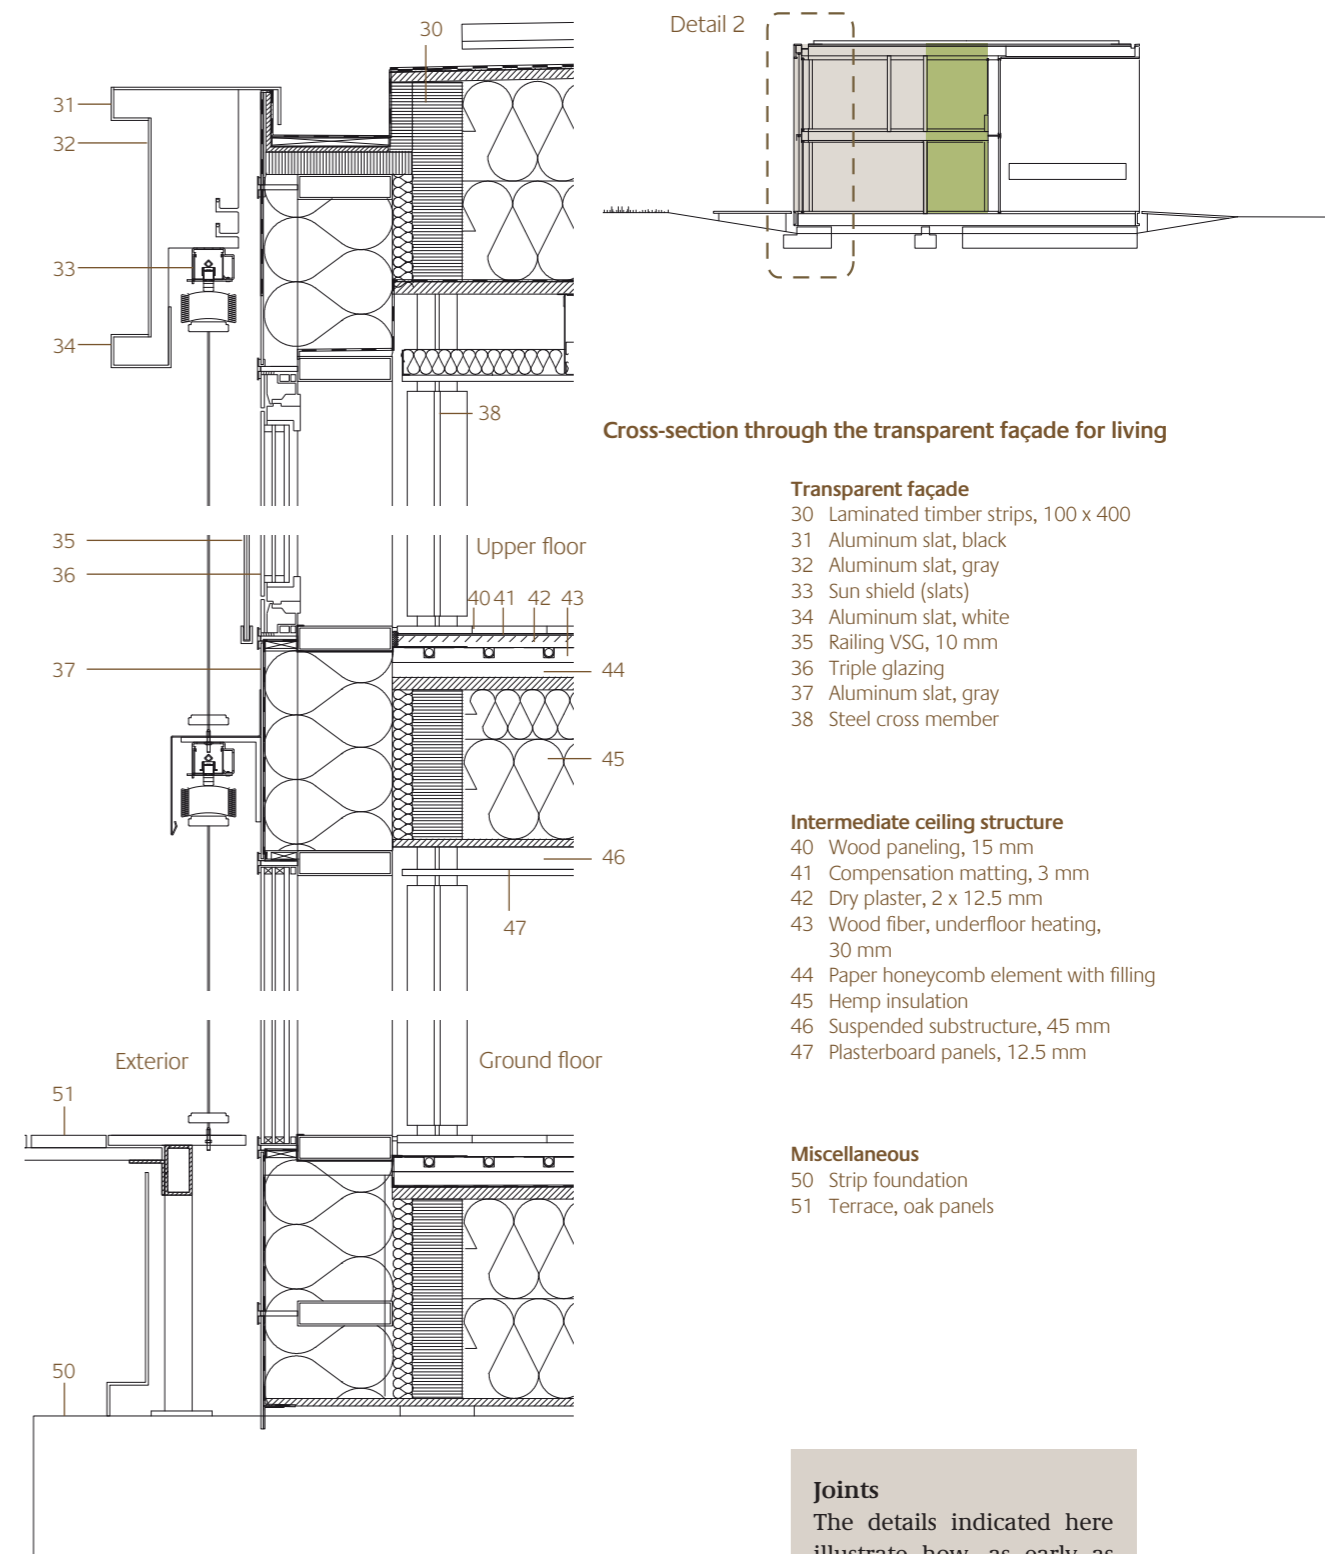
Detail 2 Cross-section through the east-facing glass façade
